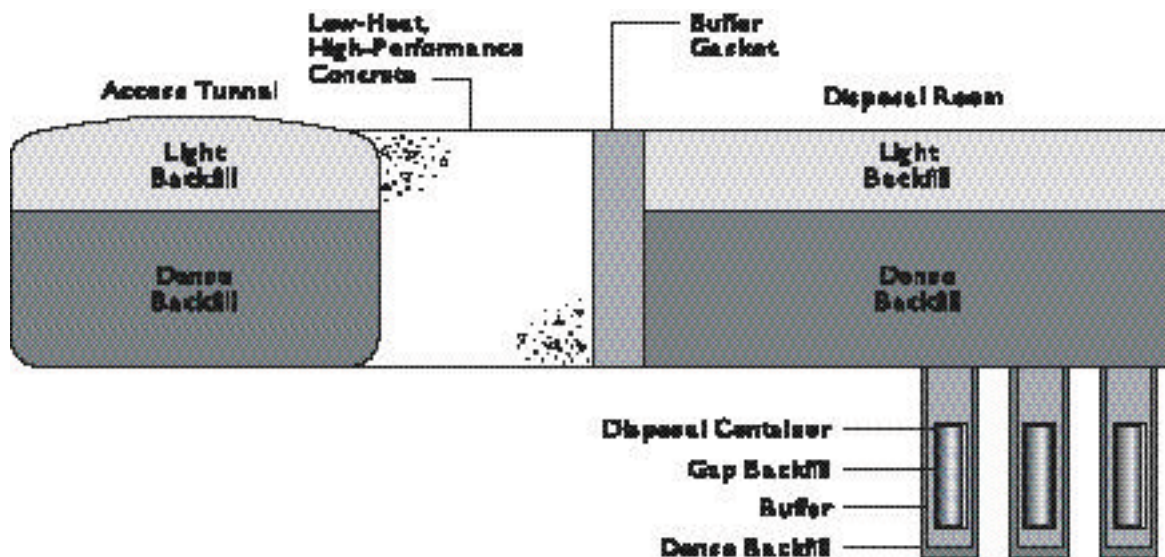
Potential arrangement of engineered barriers applied to the in-floor borehole emplacement method
